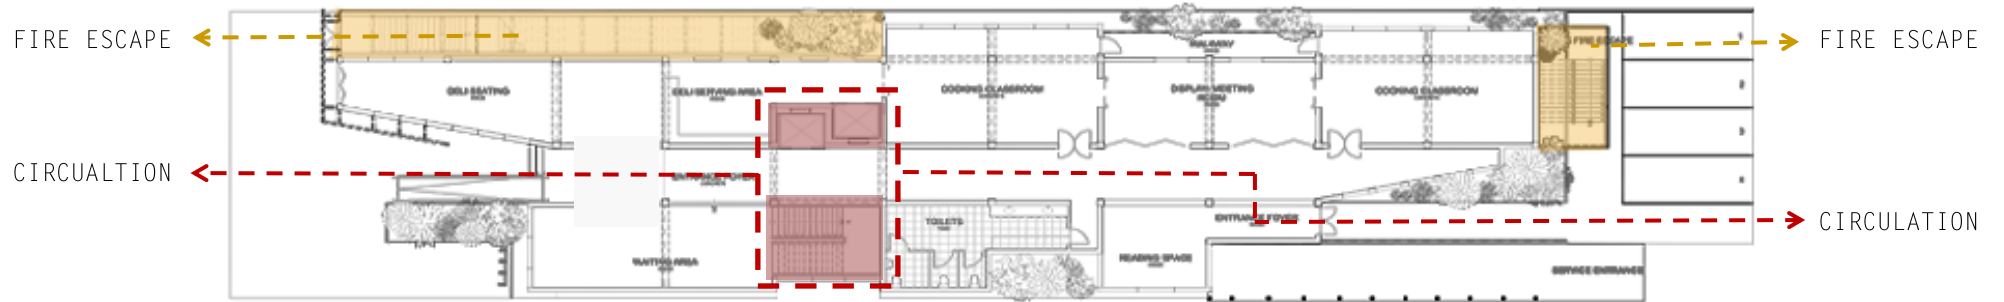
Circulation and fire escapes of proposed building, by Author, 2019.
